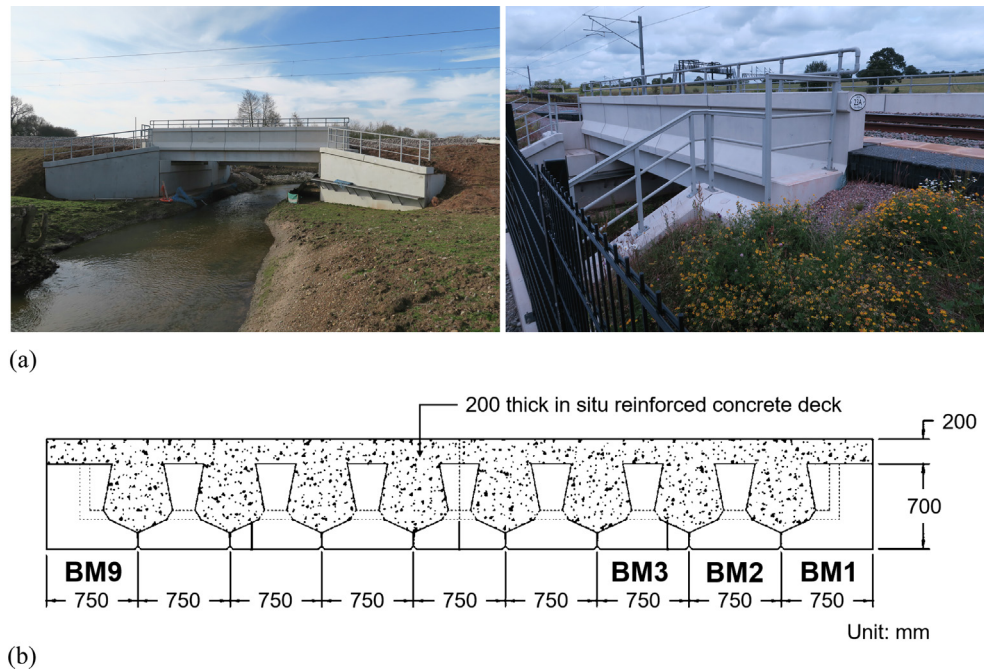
(a) Underbridge 11 (Images by LJ Butler) and (b) cross-section of UB11 deck-girder system.
